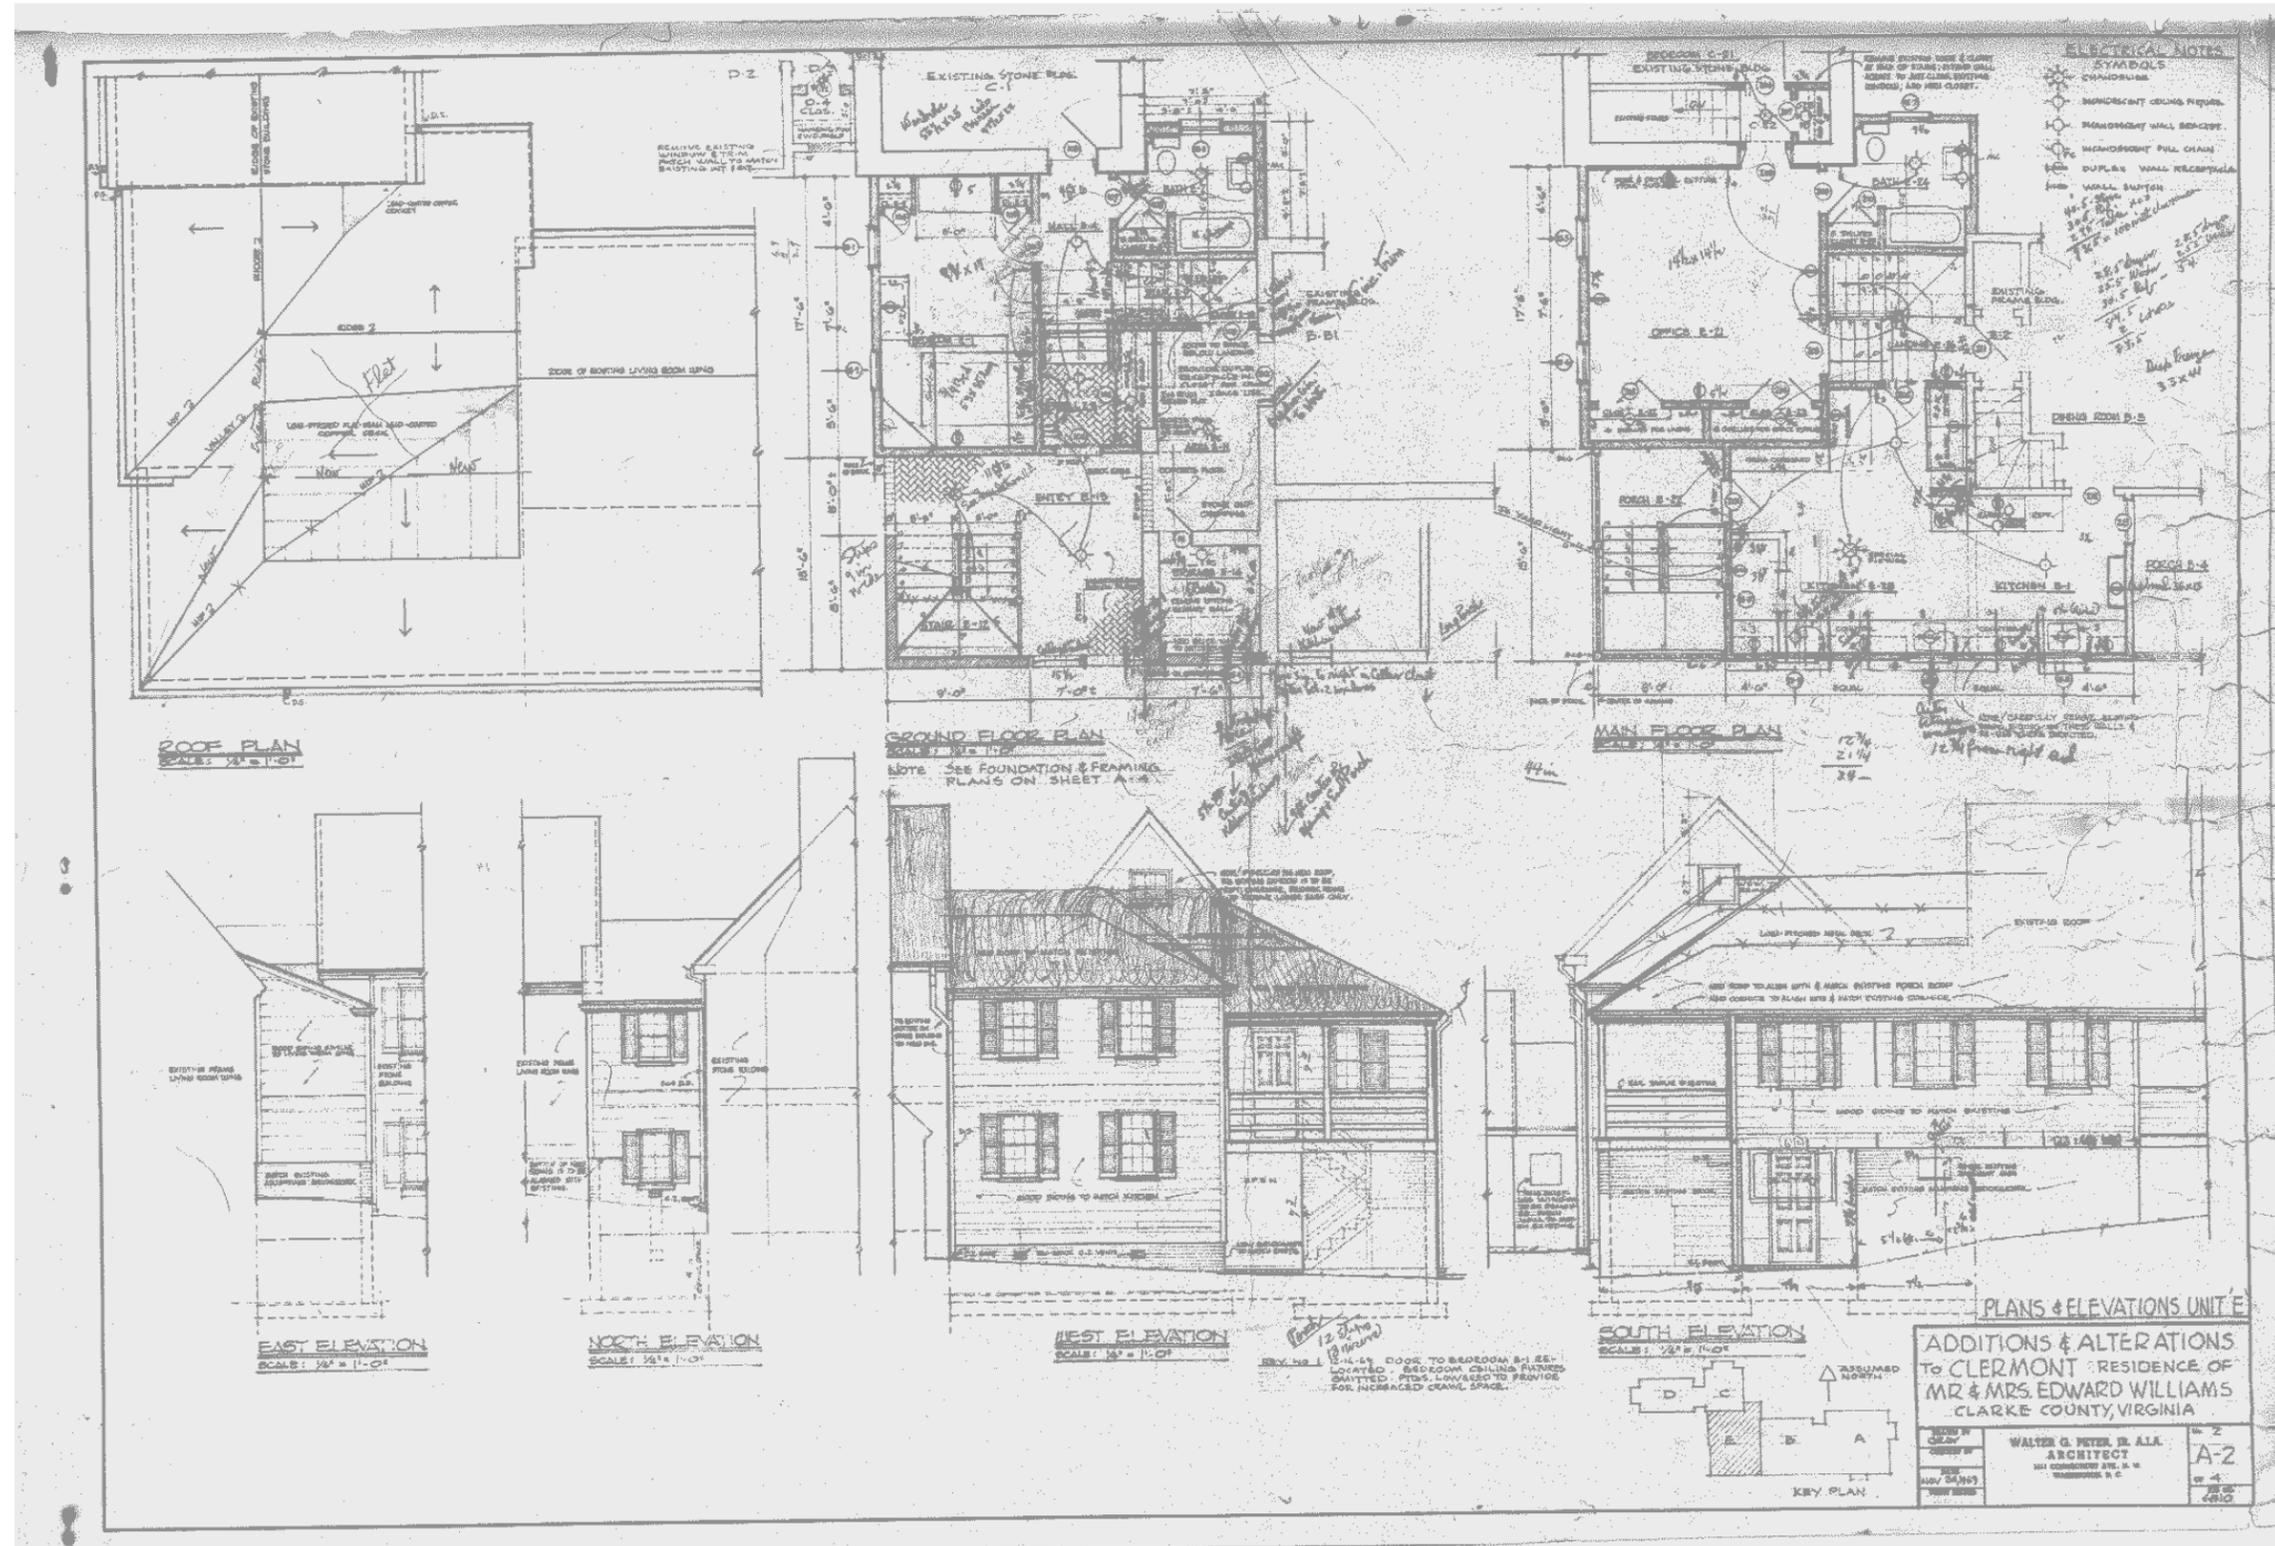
Floor plans and elevations of the 1969 additions and alterations construction drawings (not to scale).
